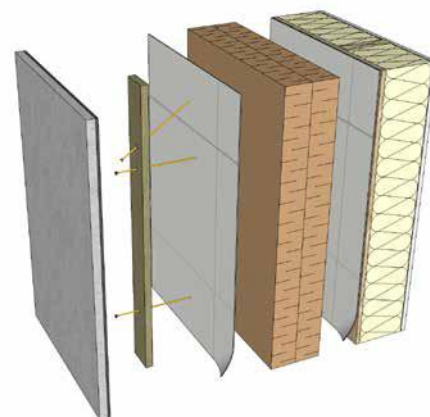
Screws installed at an upward angle can be used to limit deflection and support heavier-weight claddings if needed.
